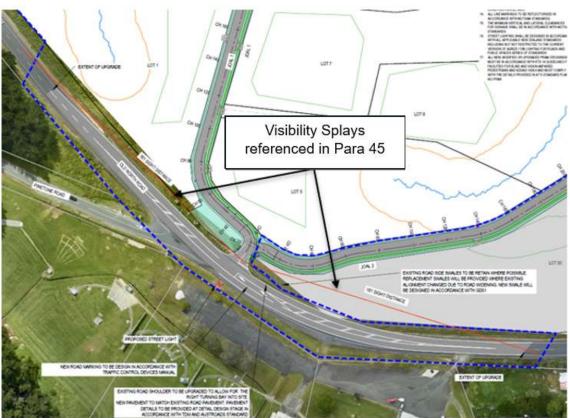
Proposed Access 1 Layout with visibility splays highlighted
